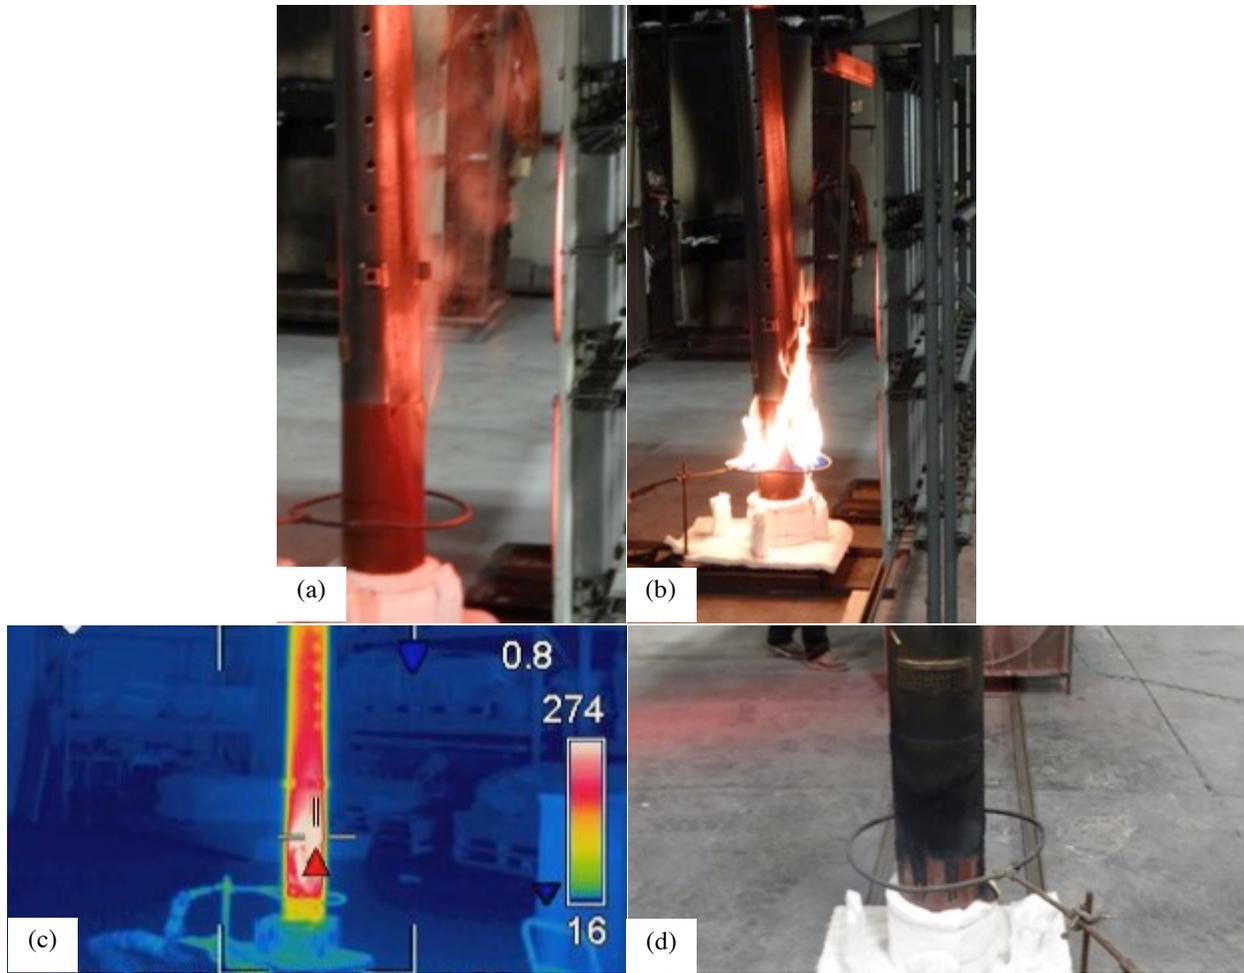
Test 1 showing (a) smoking, (b) ring burner, (c) IR in wind, and (d) after test.
